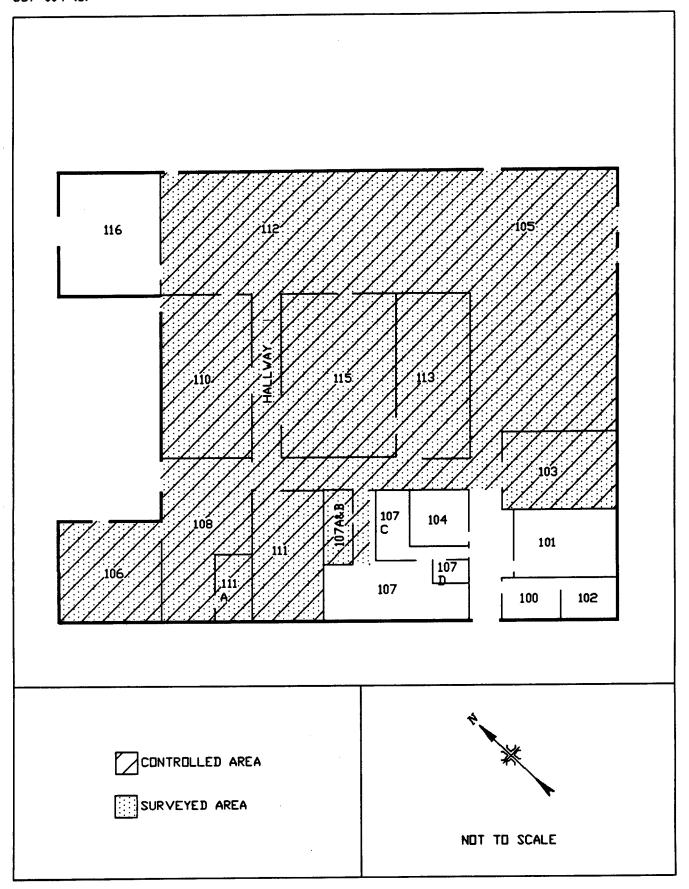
Building 005 - Floor Plan, Controlled Area, and Surveyed Areas
